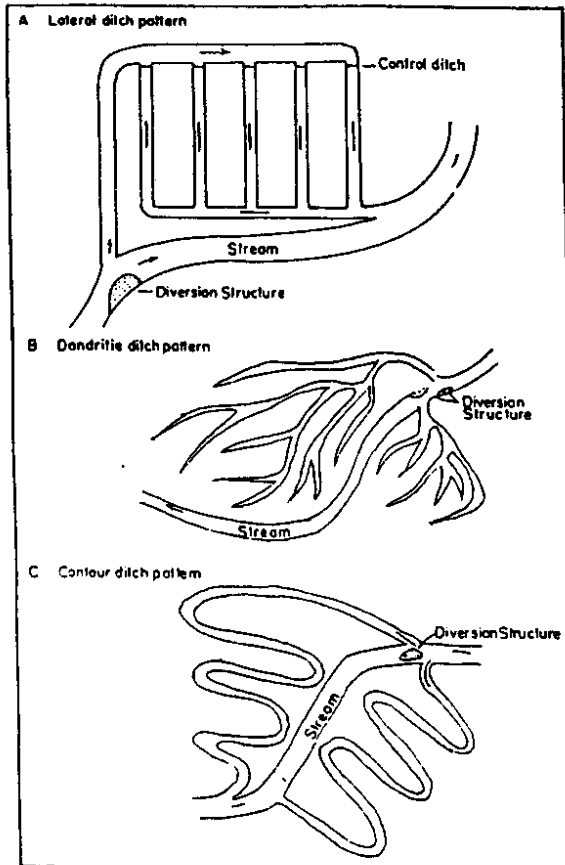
PATTERNS OF DITCH AND FURROW SYSTEM
